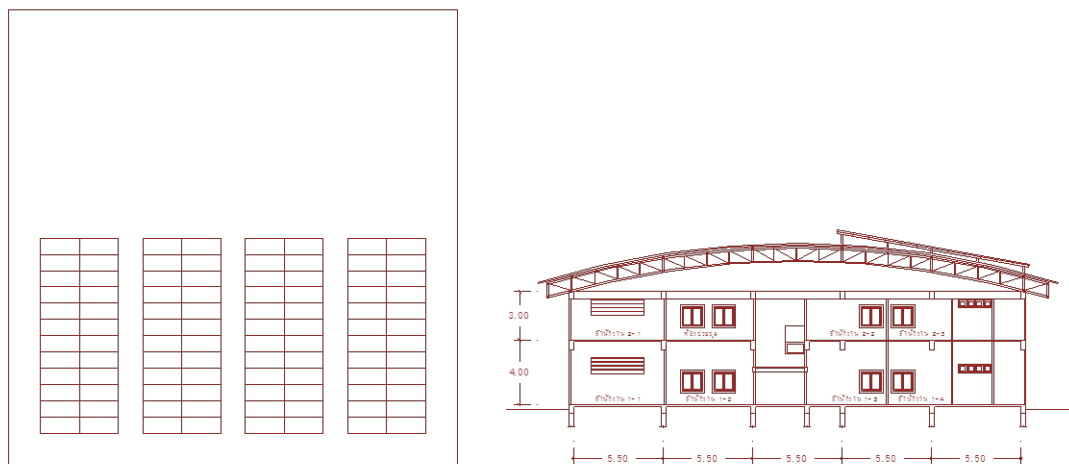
Roof plan (Left) and Section (Right) shows the Solar-cell installation.
